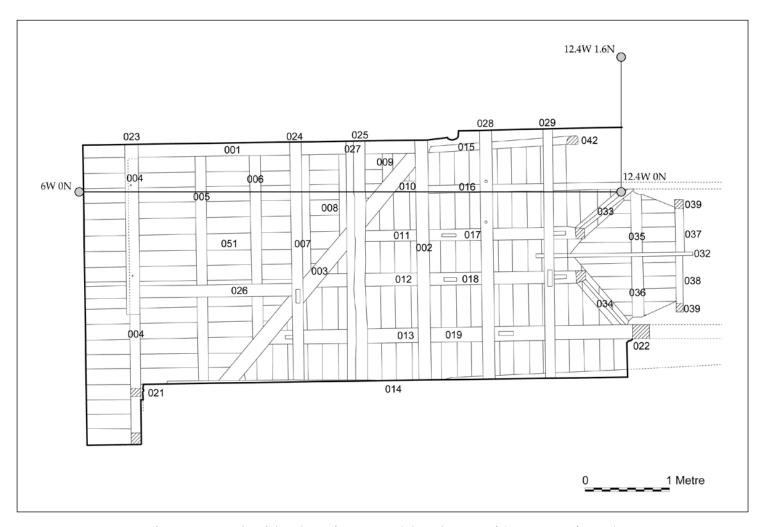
Underside Plan of West Bedchamber Roof (N to top of page)
